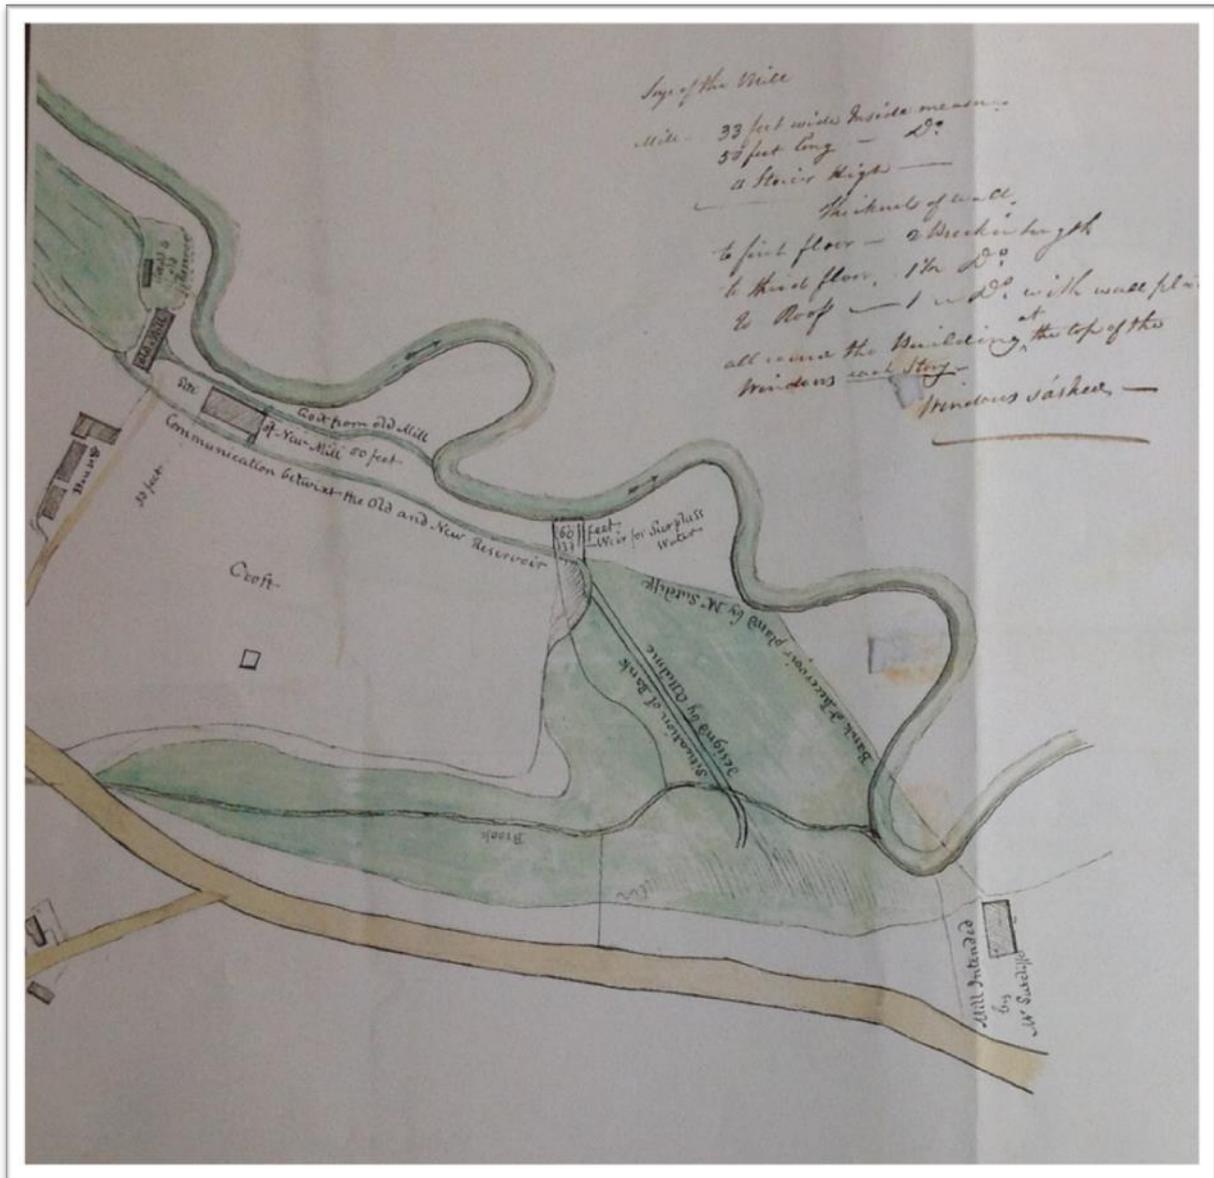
Manchester Archives E4/1/10/9 Plan for new cotton mill and reservoir (south at top)
